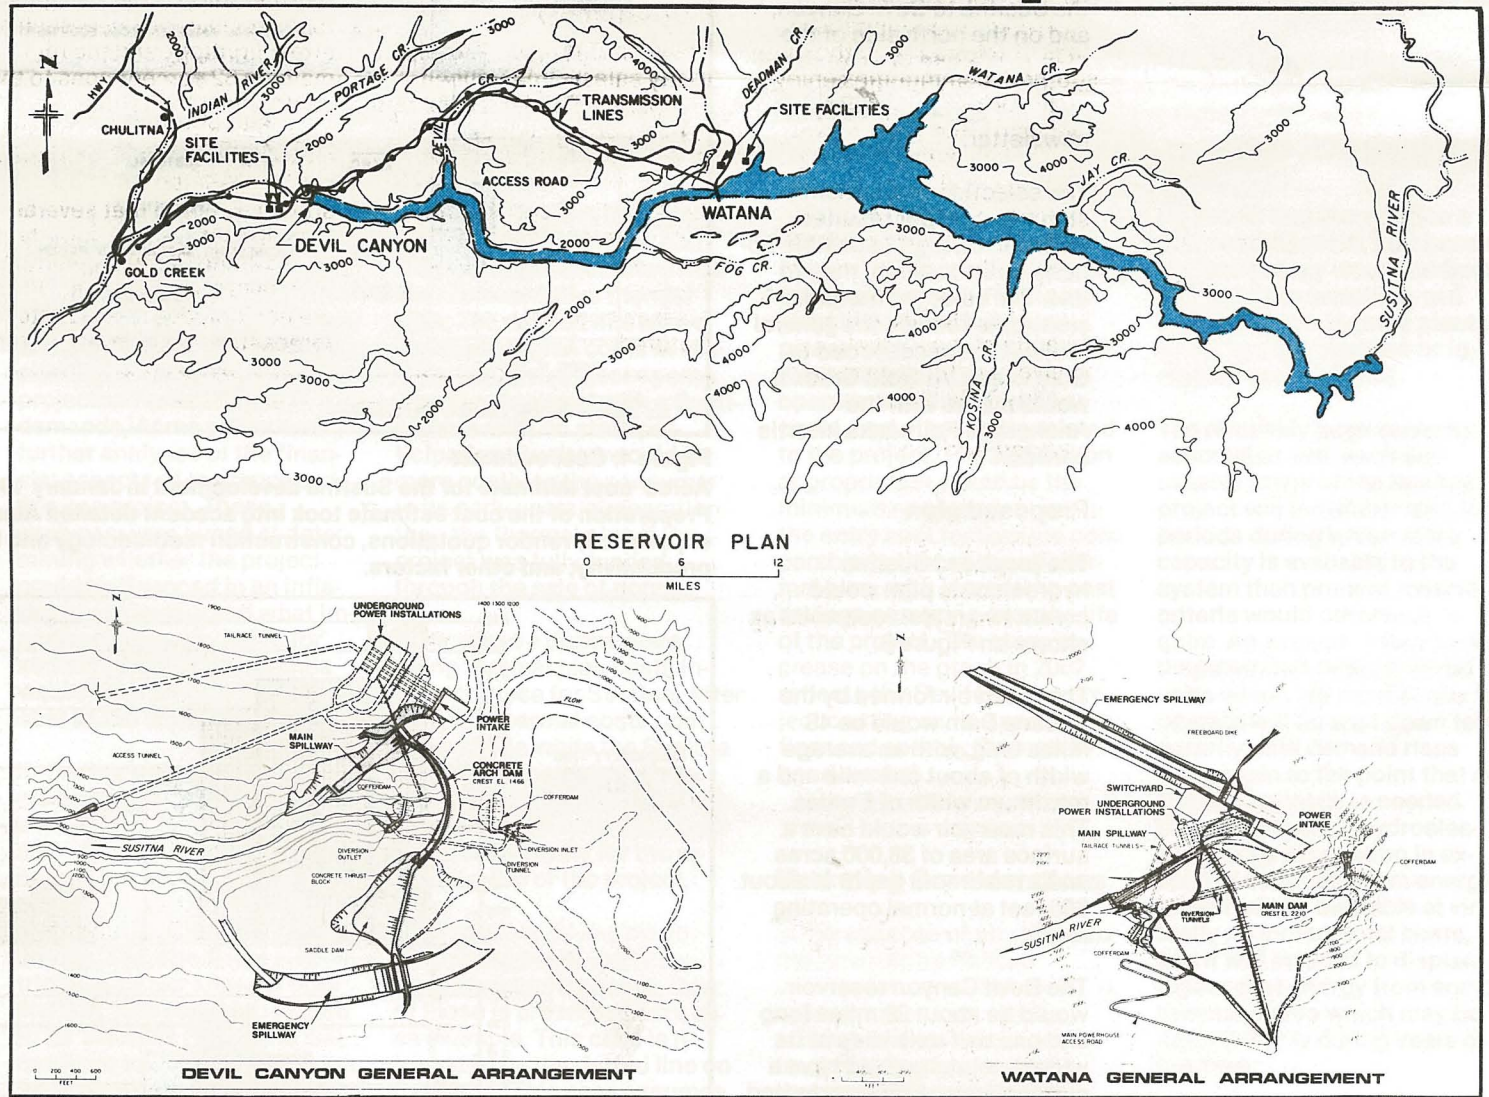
Proposed development plan. The Watana and Devil Canyon dams would create two reservoirs, 48 and 26 miles long respectively. During construction temporary full-service construction camps would be located at each dam site. A permanent town would be developed near
